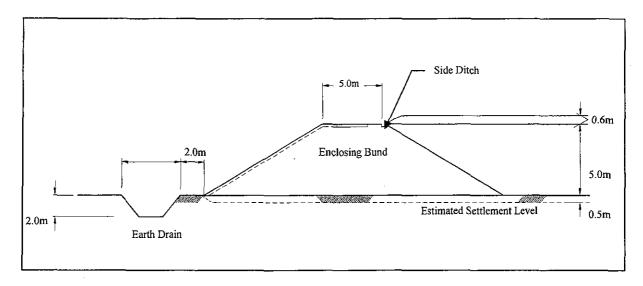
Enclosing Bund for Landfilled Waste Retaining Facility
